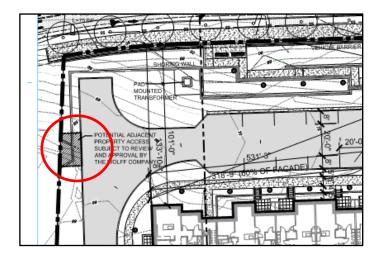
Neighborhood Street connection to Vet Property as shown on Sheet A0100, Architectural Site Plan
